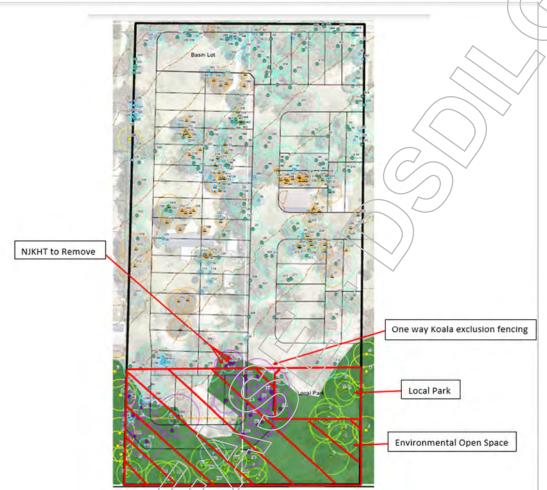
Amended subdivision plan (amendments shown in red), based on the applicant's most recent amended site plan
